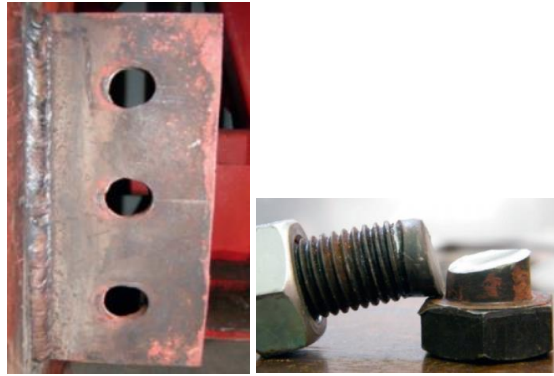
The fin-plate bearing deformation and bolt shear fracture at the end of the test
